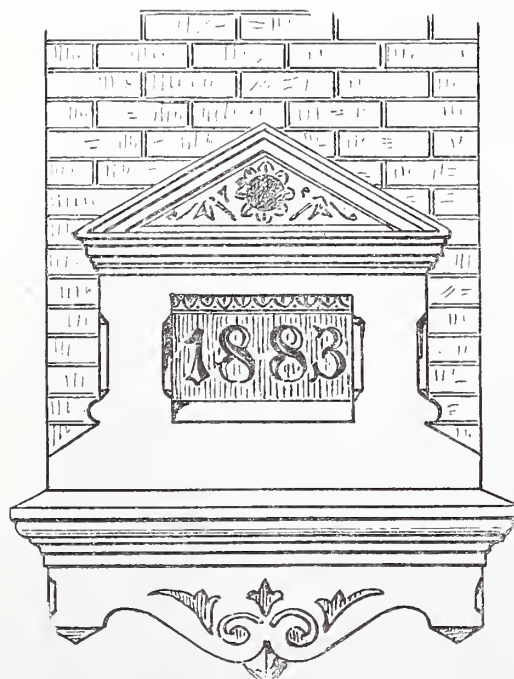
Chimney.—Scale, $\frac{3}{4}$ Inch to the Foot.
